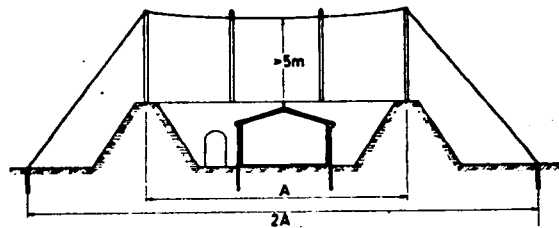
Installation of a protective network on wooden poles over a building used for the manufacture of explosives.
